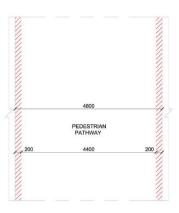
Street width and buffer spaces (in mm) for Gateway 6 in the area surrounding Offenbach am Main Hauptbahnhof
